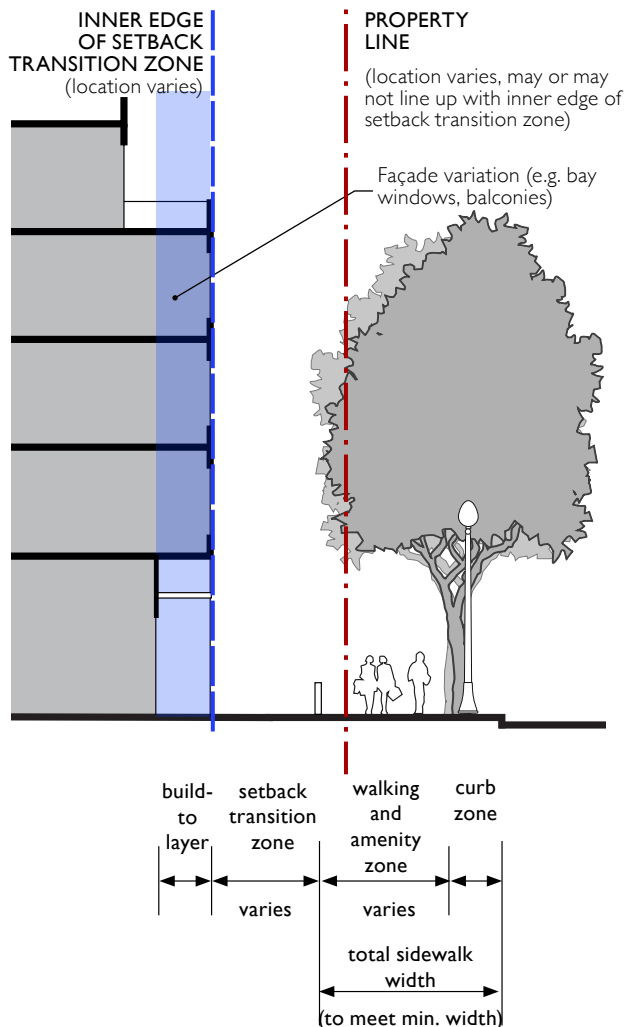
Sidewalks and Building Frontage for Urban Residential
